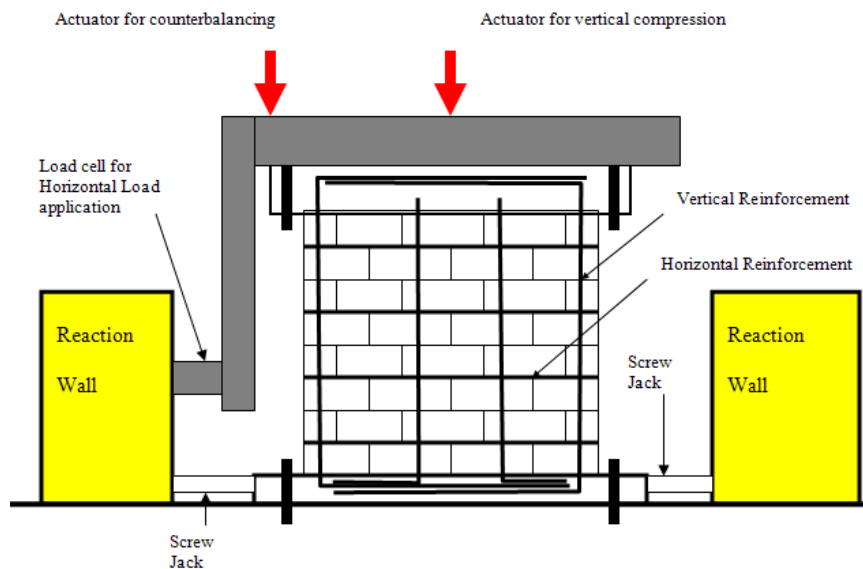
Masonry walls tested in Japan (Matsumura (1987))
